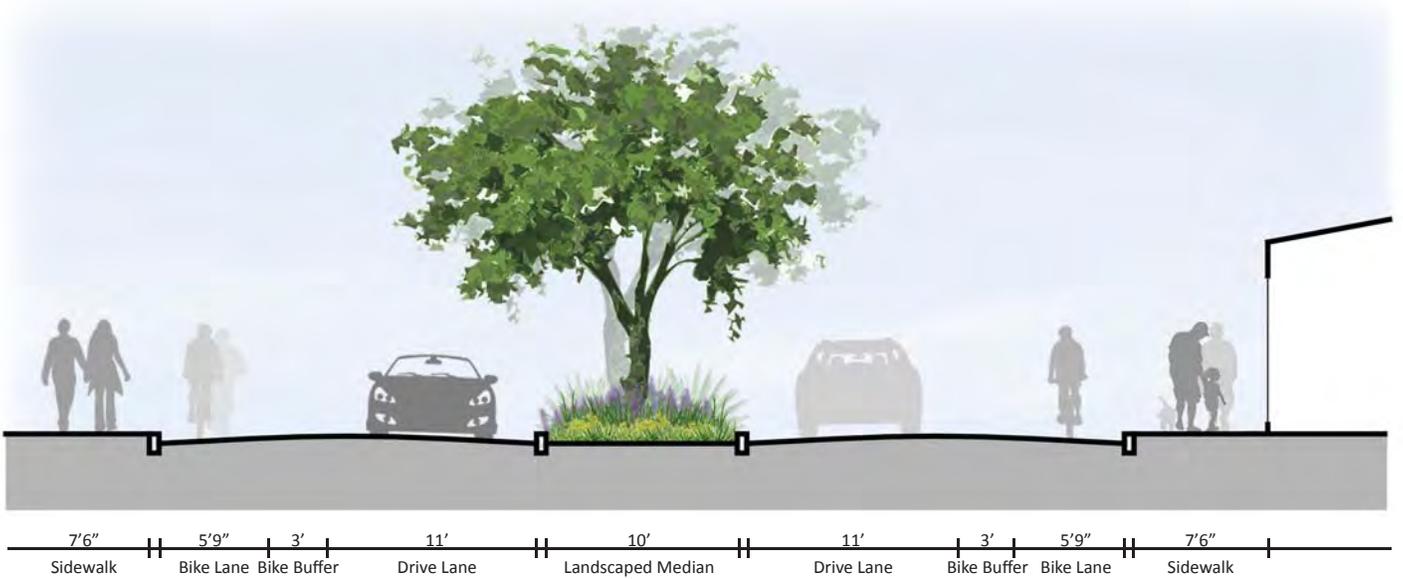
CONCEPTUAL PLAN FROM OAK STREET TO VALLEY STREET
